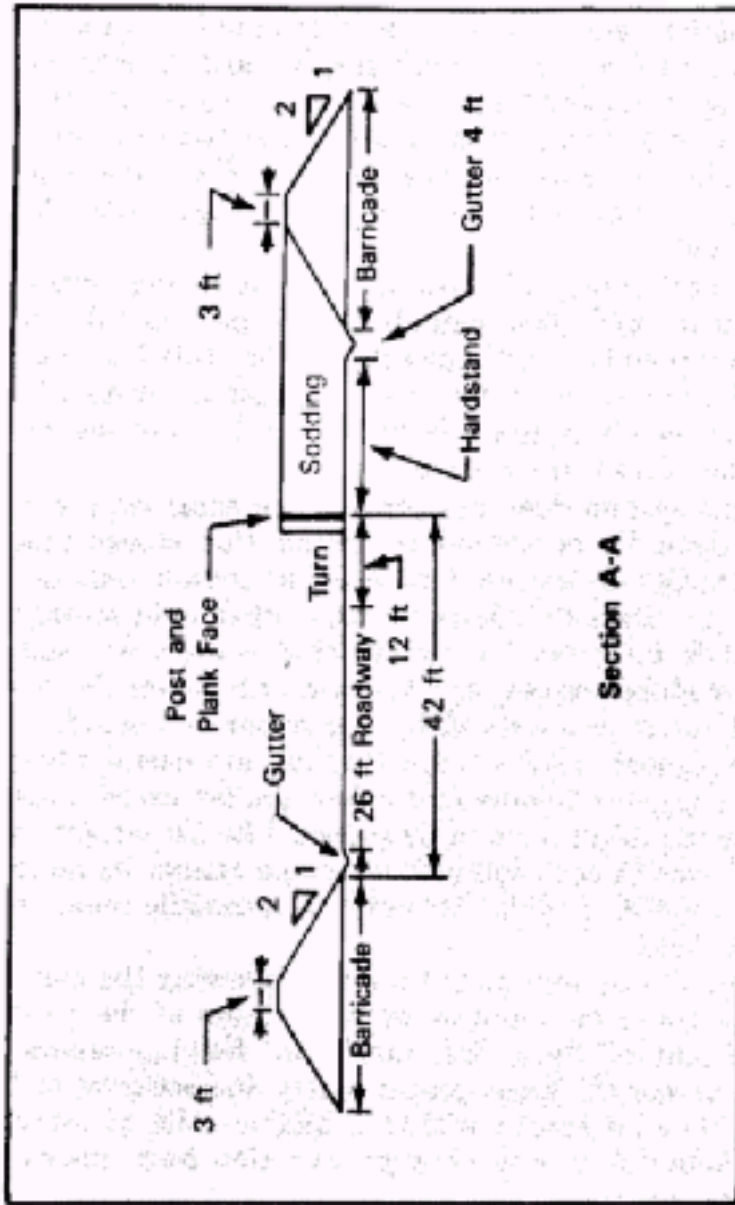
Cross Section of a Typical 8-Cell Module Storage Plan.
